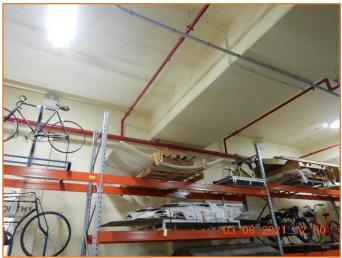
Good - General condition of slab soffit and internal masonry wall.
